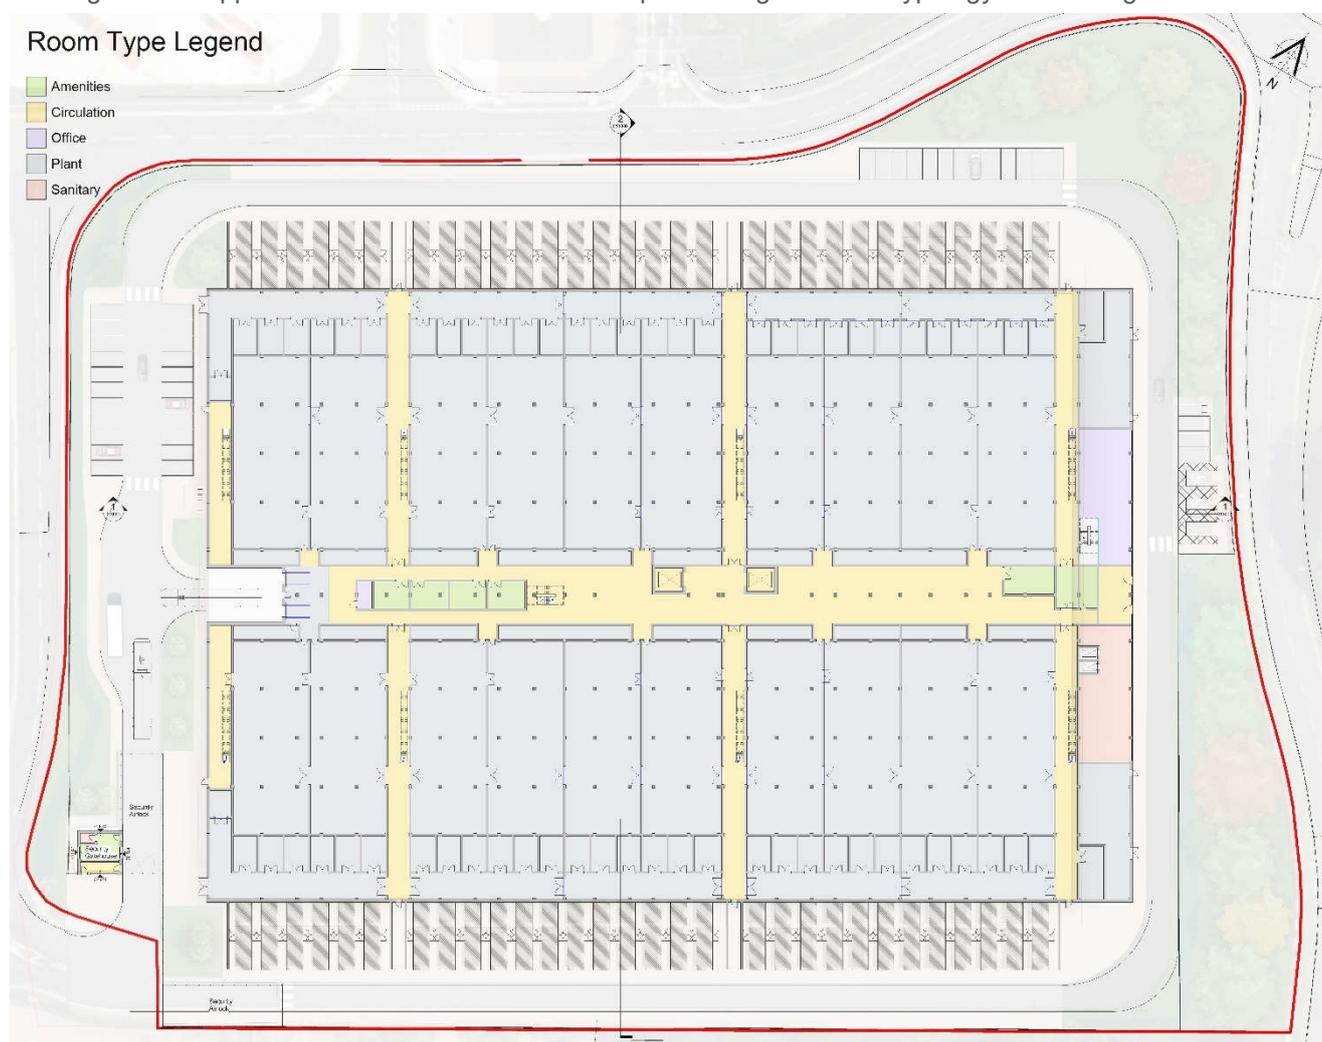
Proposed Ground Floor General Arrangement Plan
